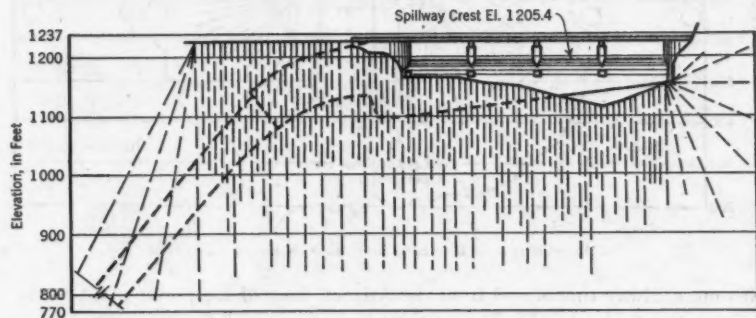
NEVADA SPILLWAY—ADDITIONAL GROUT CURTAIN
